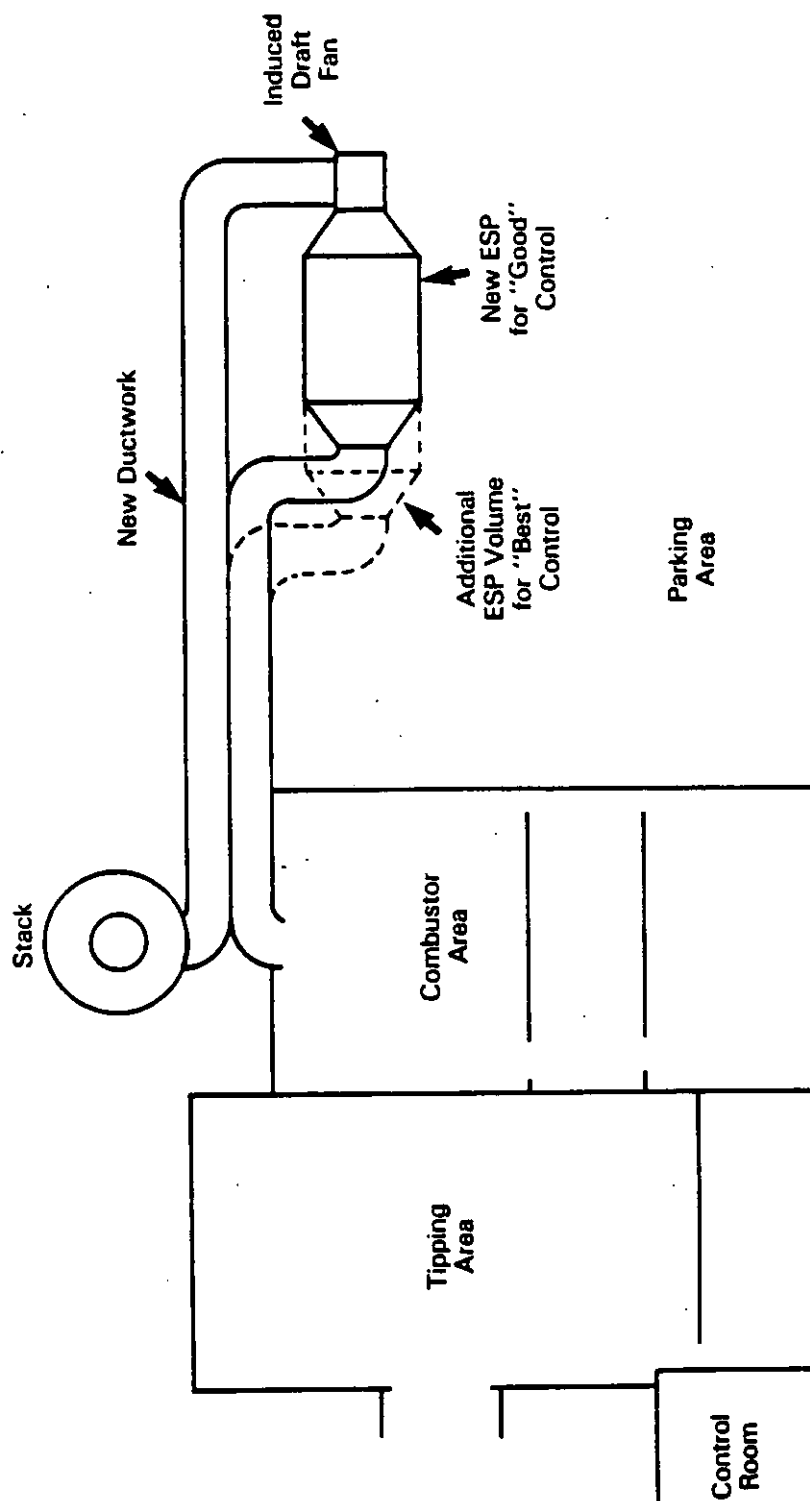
Plot Plan of Particulate Control Equipment
